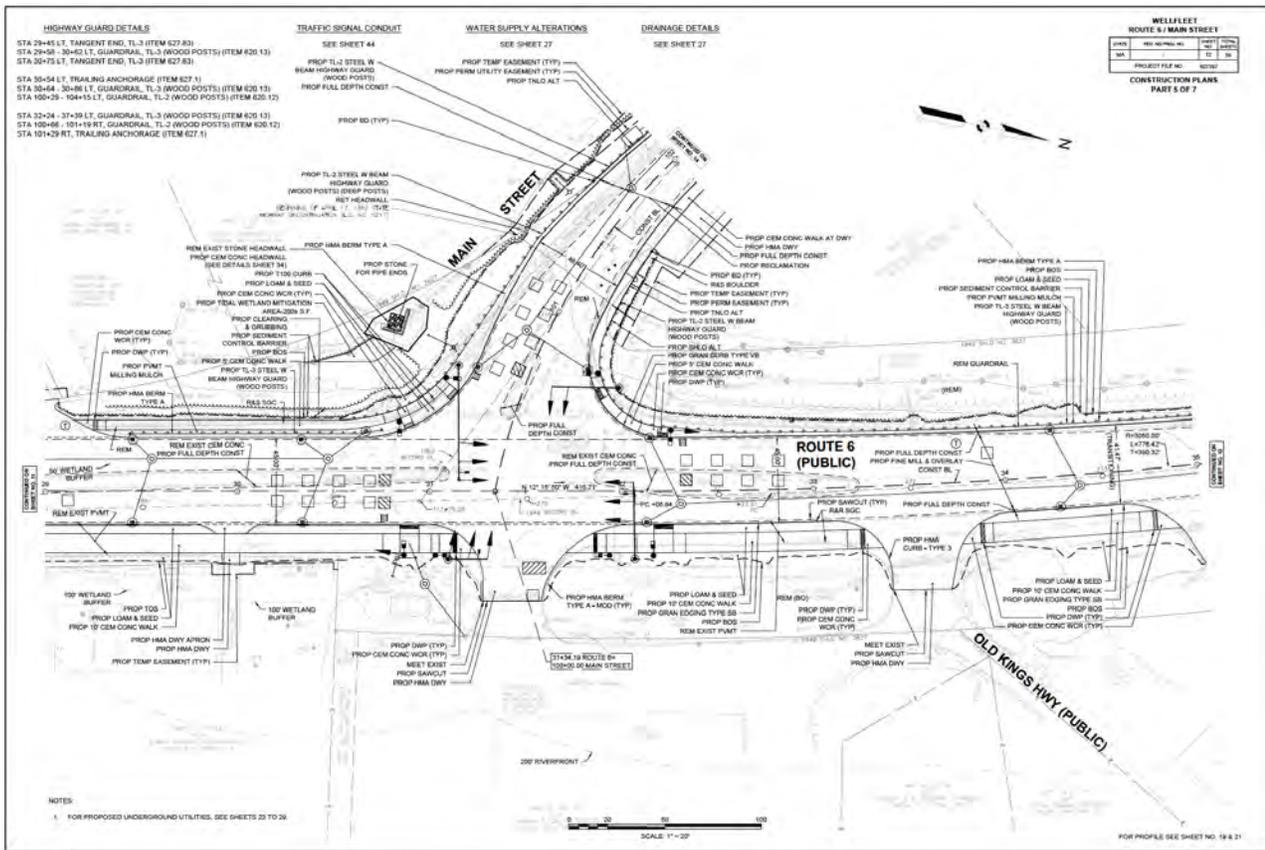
Stormwater Retrofits – Route 6/Main Street (MADOT)
